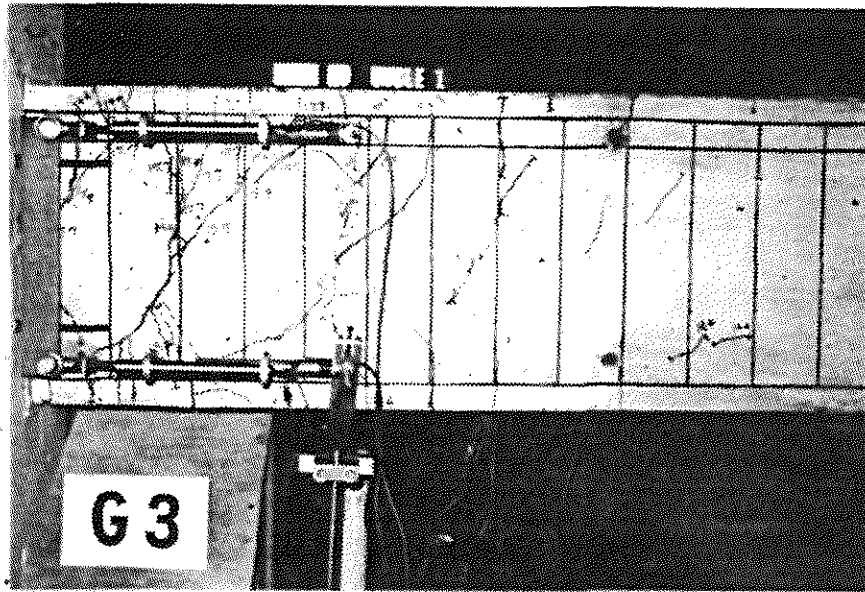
(a) Crack Pattern at the End of Cycle 1, Beam G-3
